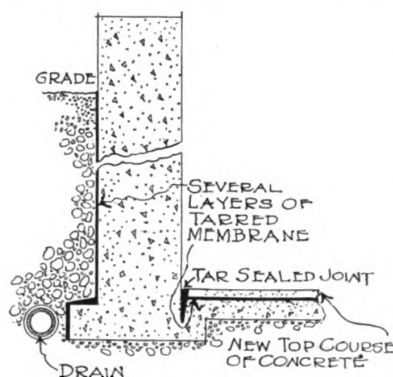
A leaky wall and floor may sometimes be repaired by digging down outside the wall, applying several layers of tar-coated burlap or canvas and laying a tile drain all around the foundation just below floor level, connecting this drain to some suitable outlet. The old concrete floor can be covered with several coats of hot tar and burlap and a new course of concrete 2 inches or more thick laid upon this. The joint between the floor and wall should, of course, be well sealed by caulking with tar-soaked oakum.
